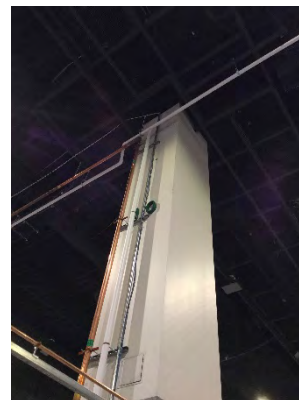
Domestic Water Distribution – Supported at Ceiling Level and then Carried Down Column to Nurse Stations
